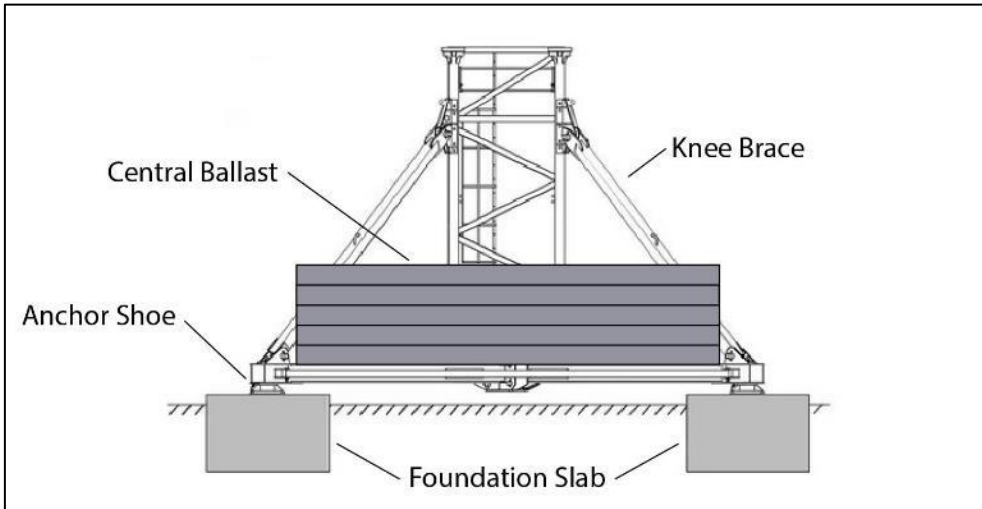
Static Foundation / Undercarriage (adapted from <https://goo.gl/eY2J0N>)
